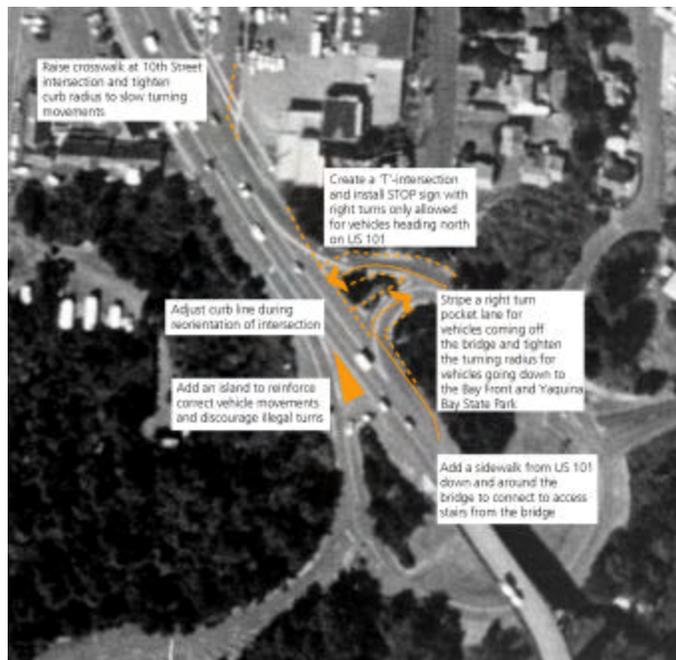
Recommended Improvements, North Bridgehead, Yaquina Bay Bridge
